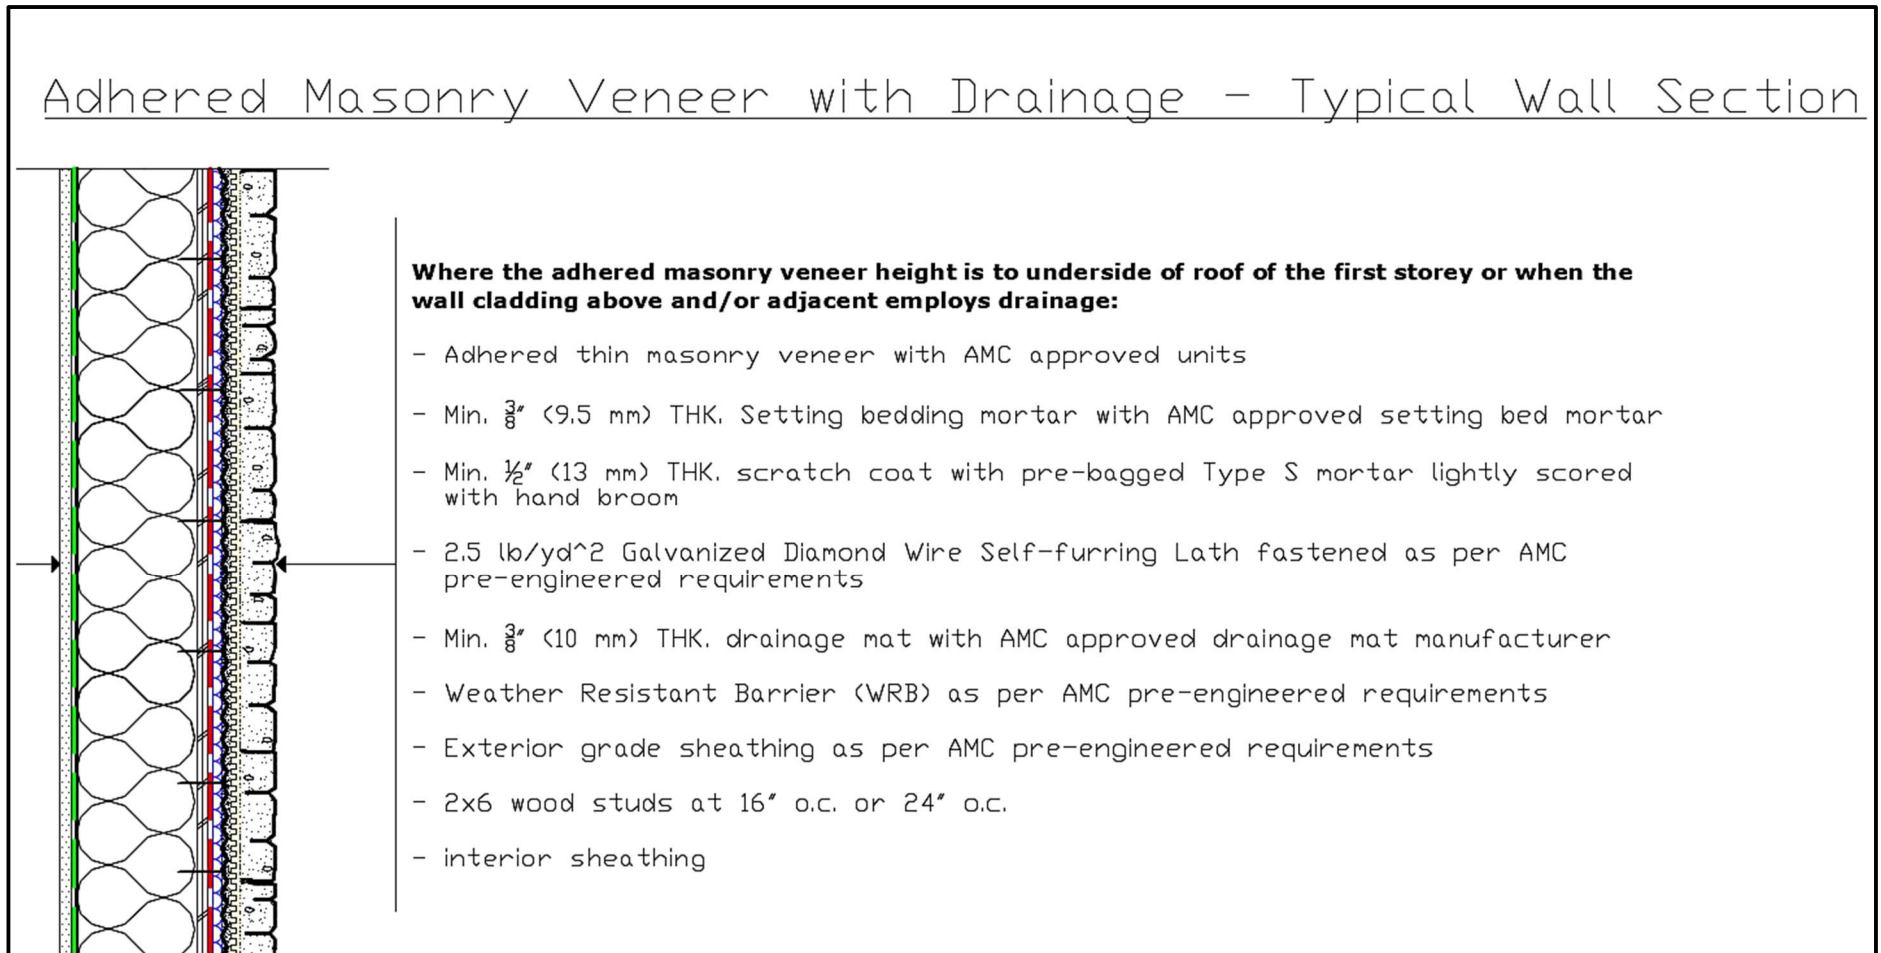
2D Detail of Components of Adhered Manufactured Stone Veneer with a Drainage Mat.
